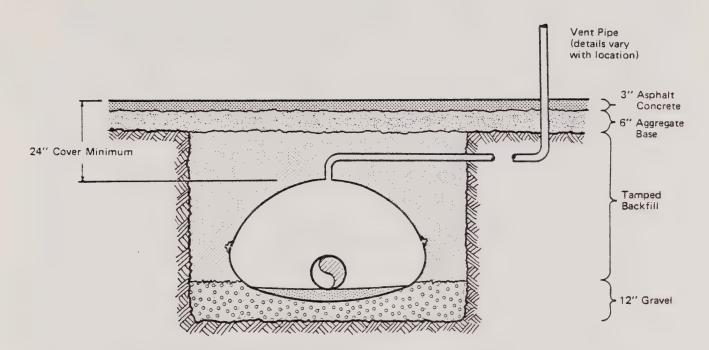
(a). TYPICAL INSTALLATION BENEATH ROADWAY (CYLINDRICAL AND BOX SECTION CASINGS ARE SIMILAR)
